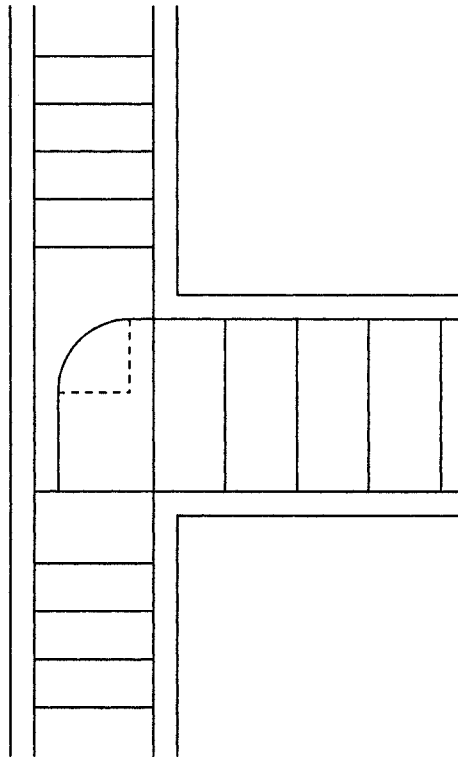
Corner Beam-Column Connection with a Bend Radius Larger Than Minimum
